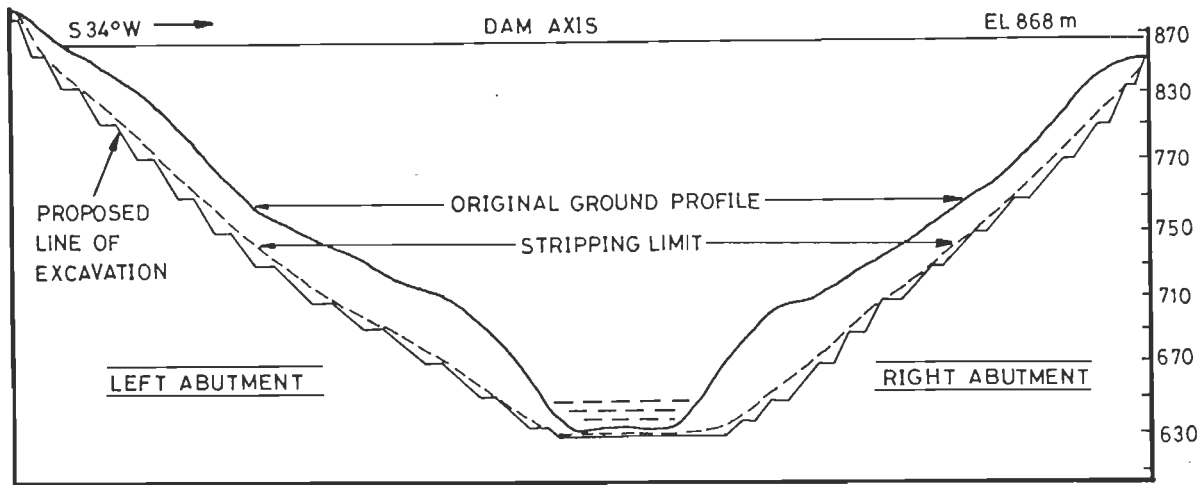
SLOPE DESIGN OF LEFT AND RIGHT ABUTMENT OF THE KISHAU DAM.
